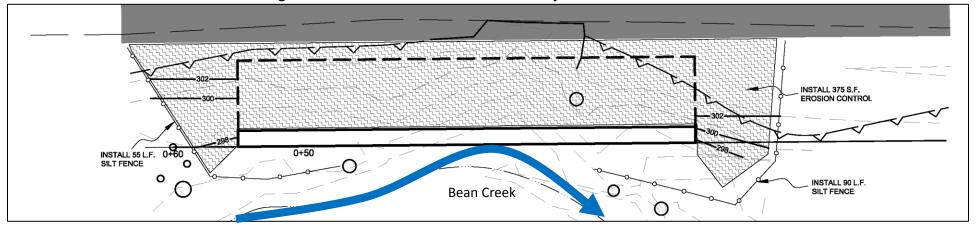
Bean Creek Road PM 1.0 Cribwall Project Layout
